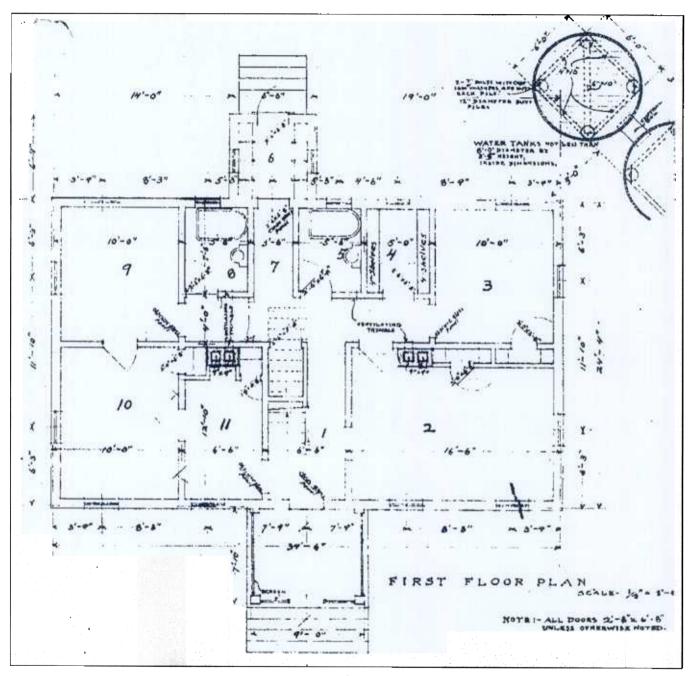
Original drawing of first-floor plan of station house (Source: Coast Guard Academy Library)
